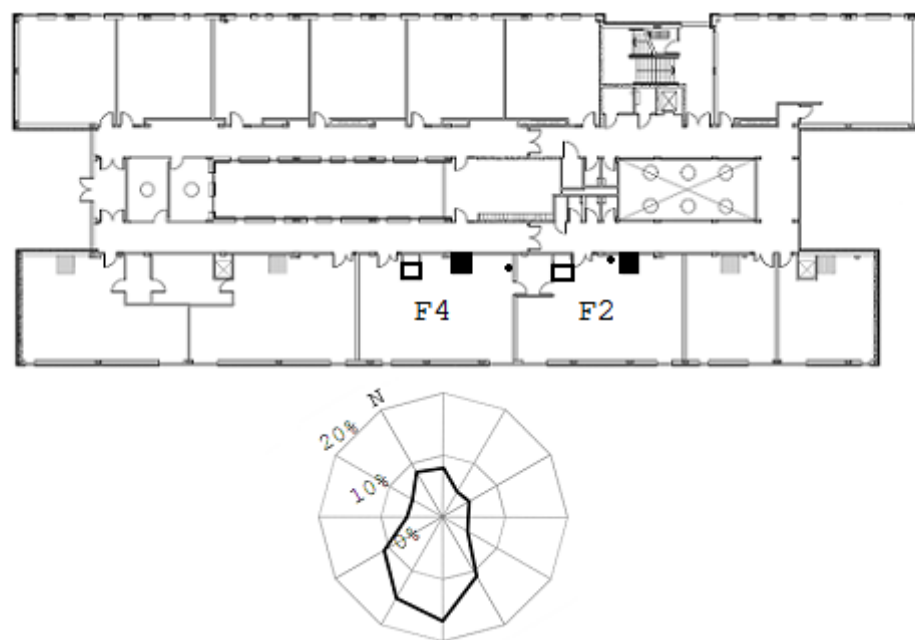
School F, plan view, first floor. F2 and F4, floor area 92.75 m².
